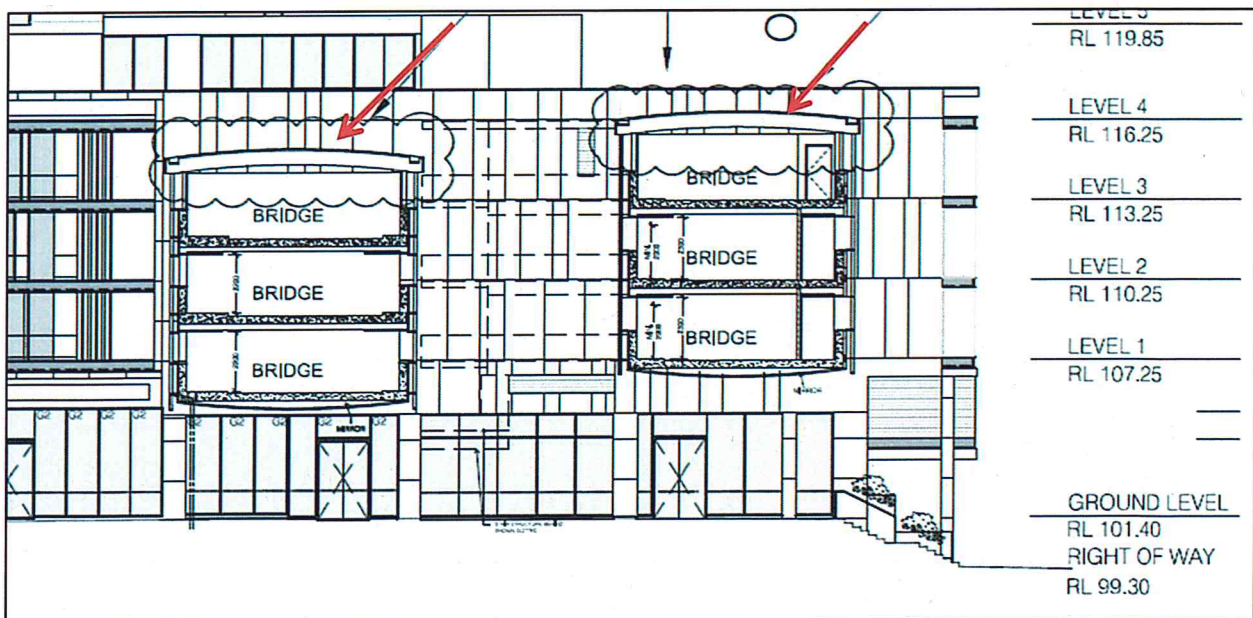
Section Plan of approved bridges at levels 1, 2 and 3 with the proposed roof structures and elevation of glass walls facing Thomas Street and Albert Avenue.
